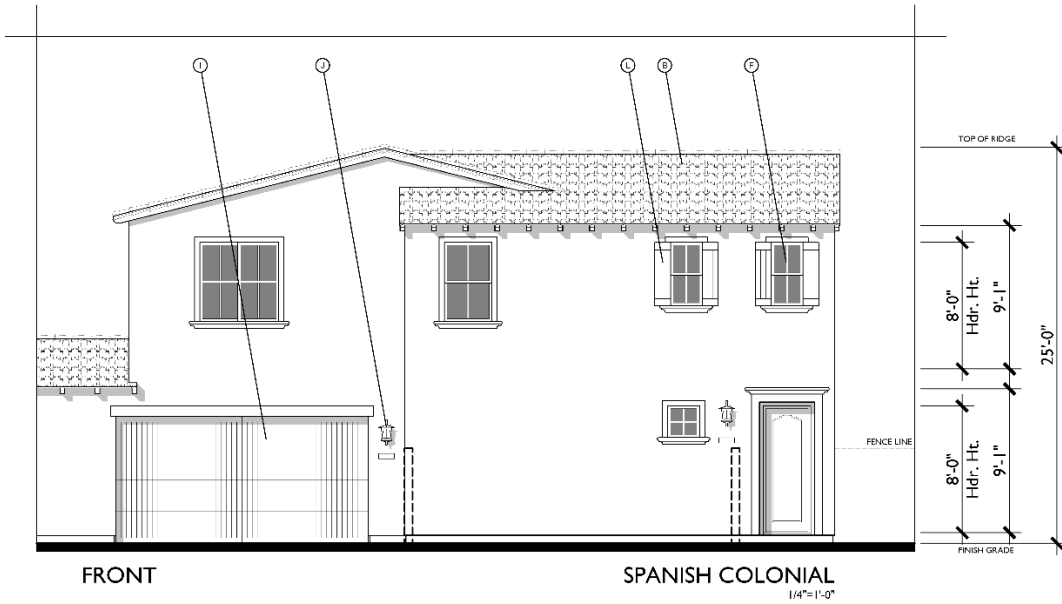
Spanish Colonial Elevation - Cluster Plan 2
